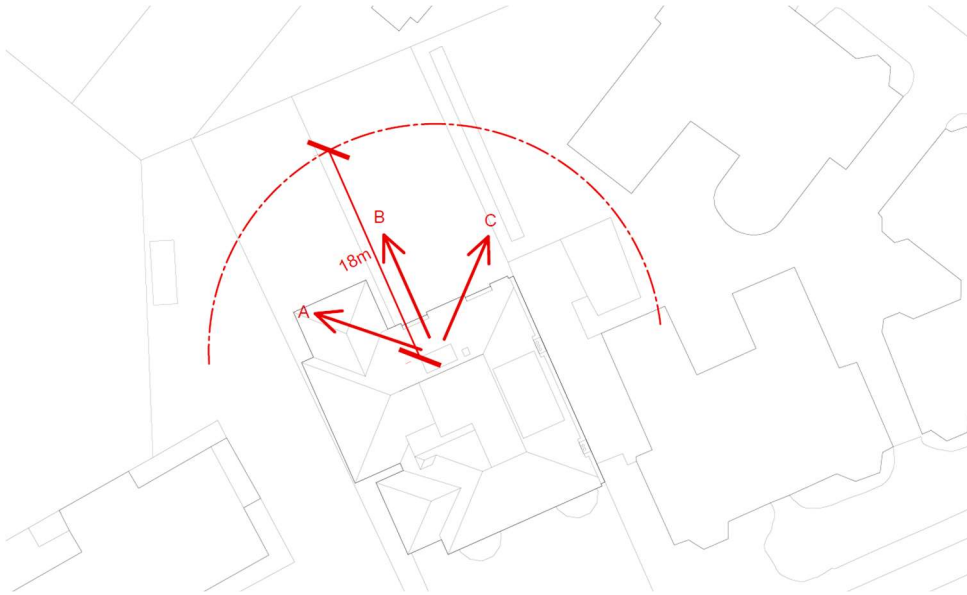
Site plan / key showing 18m threshold from as built dormer.
